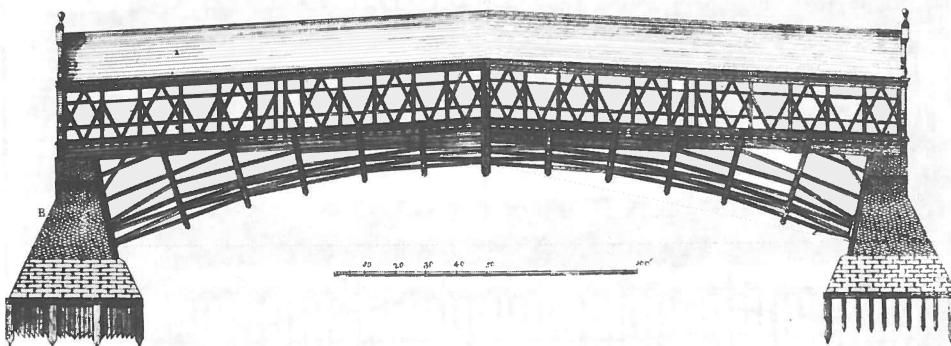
Scheme for a 250-foot timber arch (or arch-truss) bridge. Walter built a 1:20 scale model and loaded it with '10 hundredweight and 10 strong men' to justify the design [Walter 1766]
